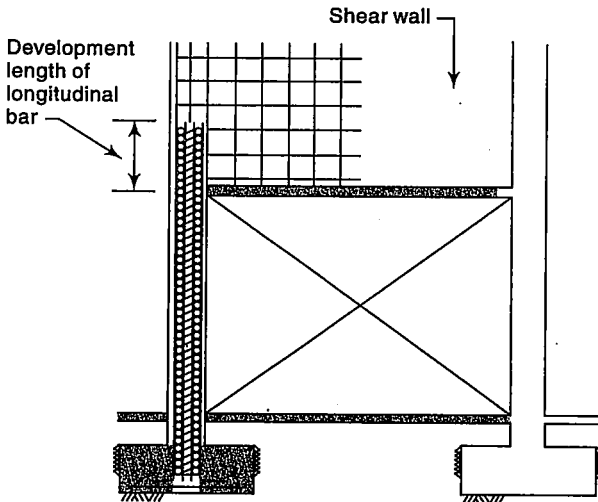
Special confining reinforcements for columns under discontinued walls
